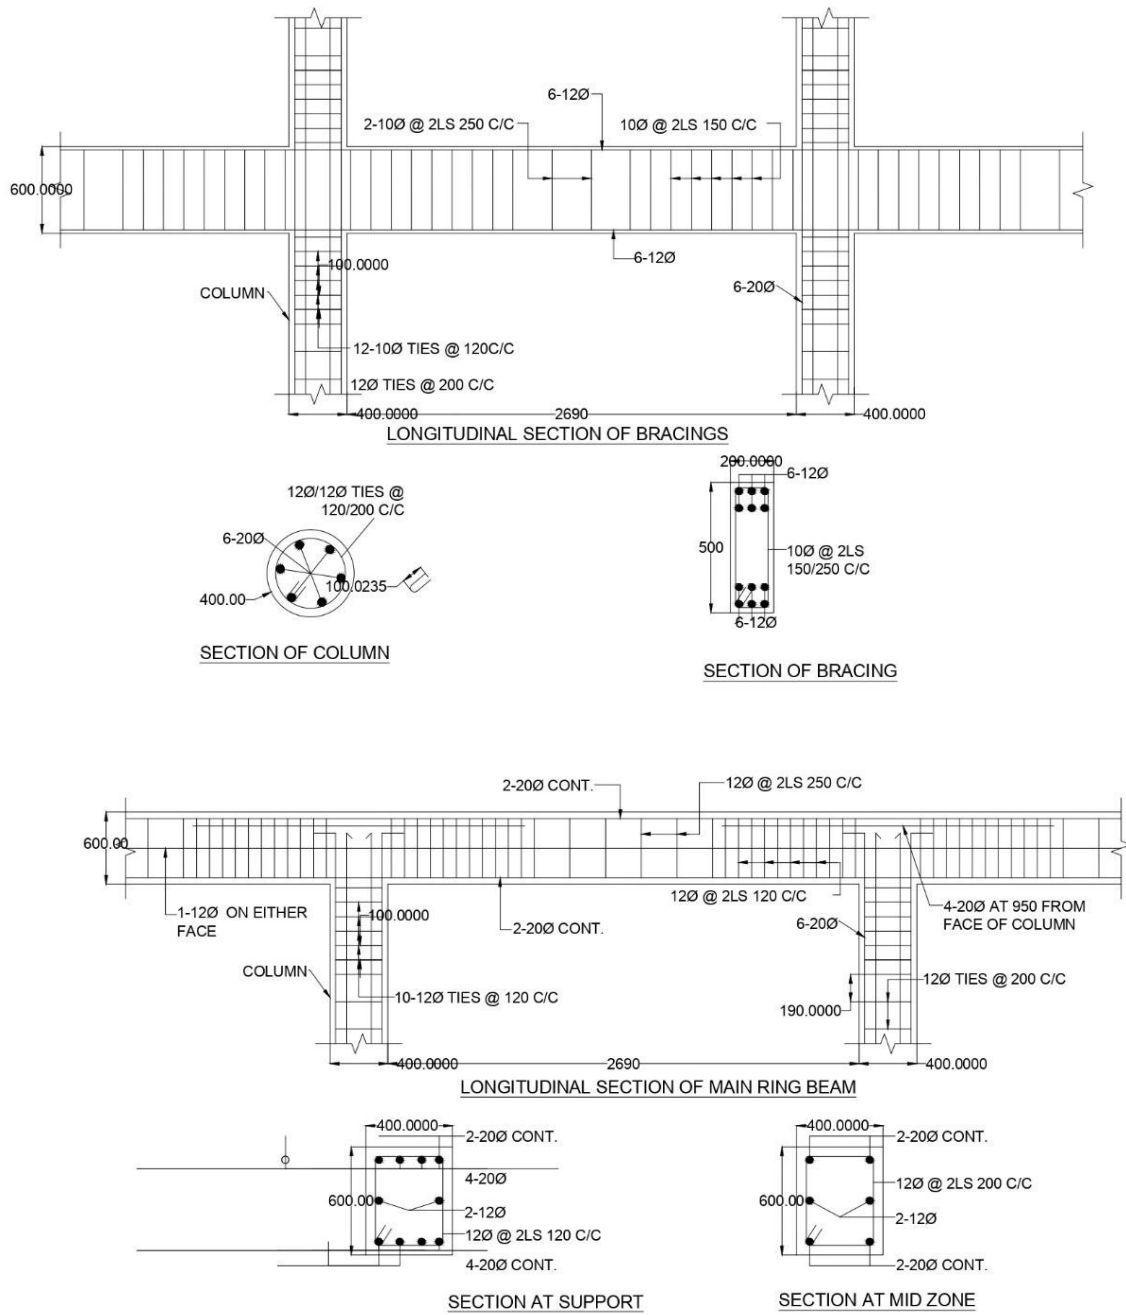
Reinforcement plan of main ring beam and bracings of hybrid Intze tank
